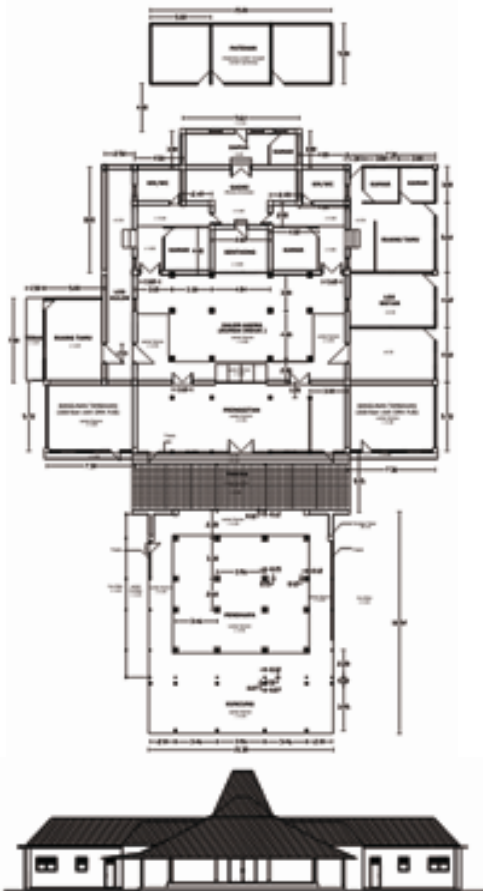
Existing Condition Plan of Dalem Notoyudan.
